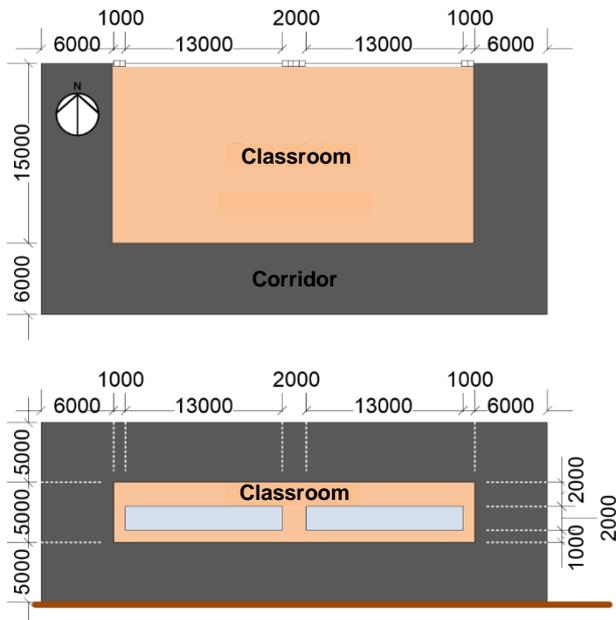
Floor plan and elevation views of the modelled classroom building; units in mm
